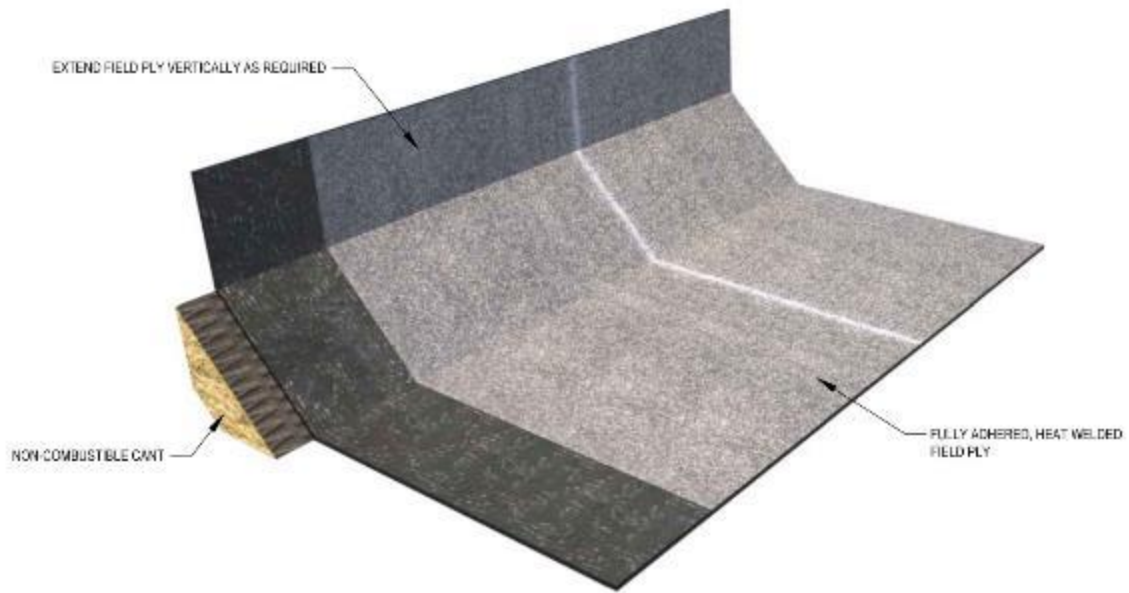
Fully Adhered, Heat Welded Vapor Retarder Termination at Wall/Curb With Cant
